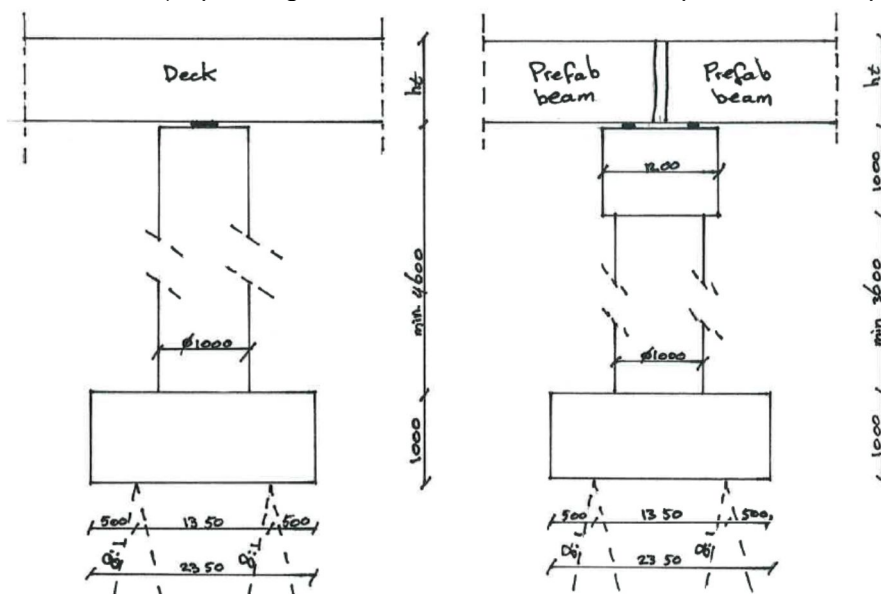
Cross section intermediate pier. Left: In-Situ, right: Prefab
